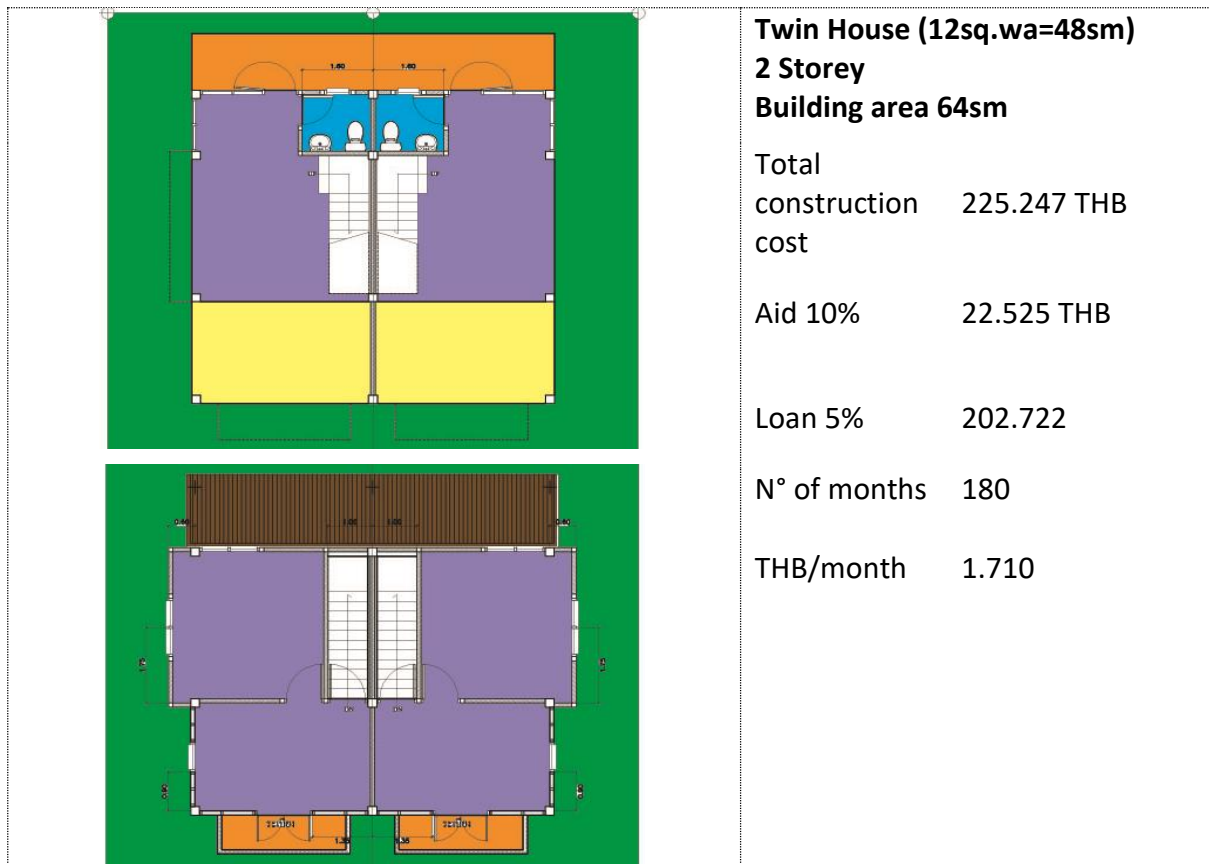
Plans of the two storey Twin House (1st floor on the top, 2nd floor on the bottom)
